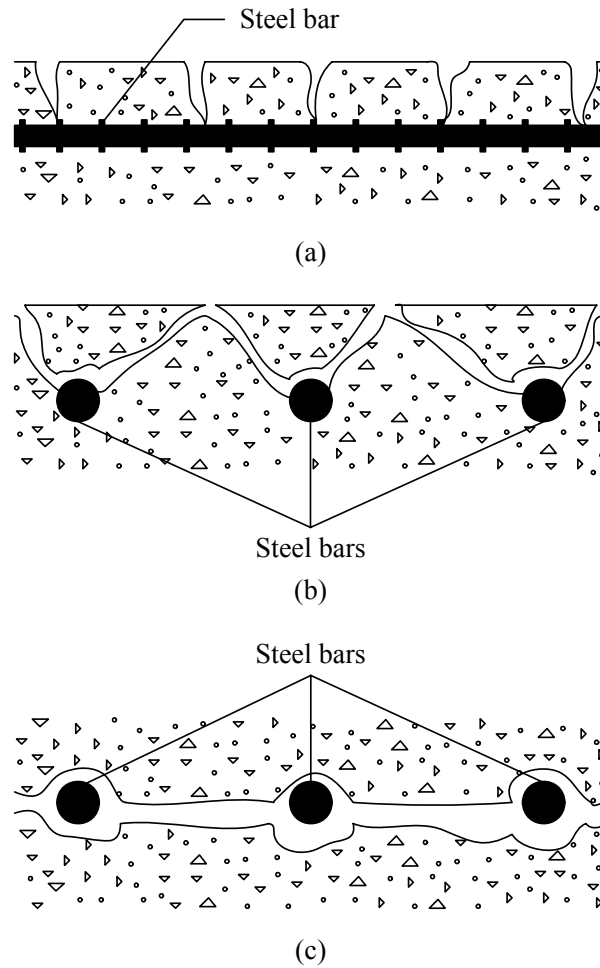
Deterioration process of reinforced concrete structure due to corrosion of steel bars
